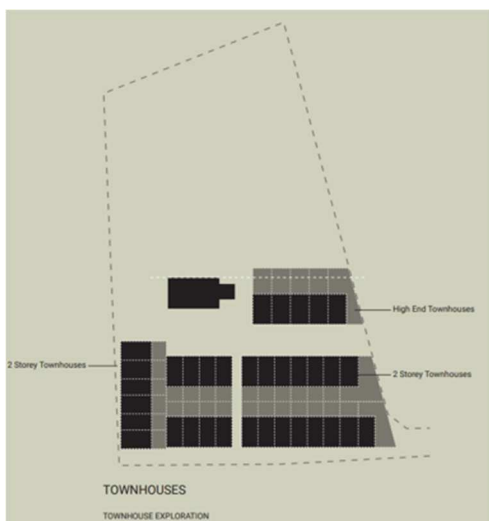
'Townhouse exploration' option for 34 townhouses, including five high-end townhouses east of Kardinia House. Source: Plus Architecture, 2024.
